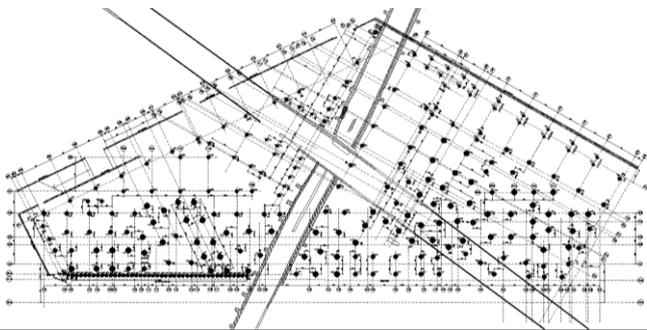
Building ENI 4: foundation piles setting out /Edificio ENI4 pianta pali di fondazione.
